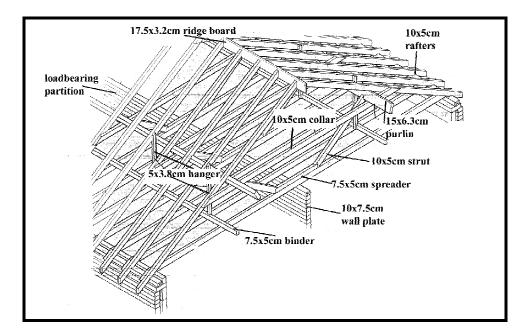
Purlin roof construction (Foster, 1983:180).
